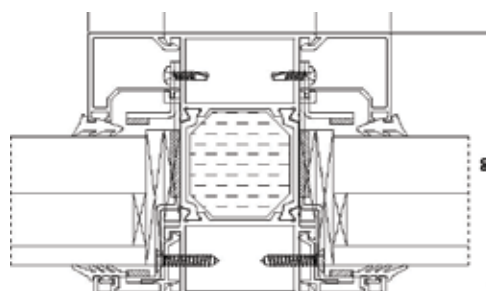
Horizontal cross-section through the internal wall (W) and external wall mullions (Z) - EI30, EI60
